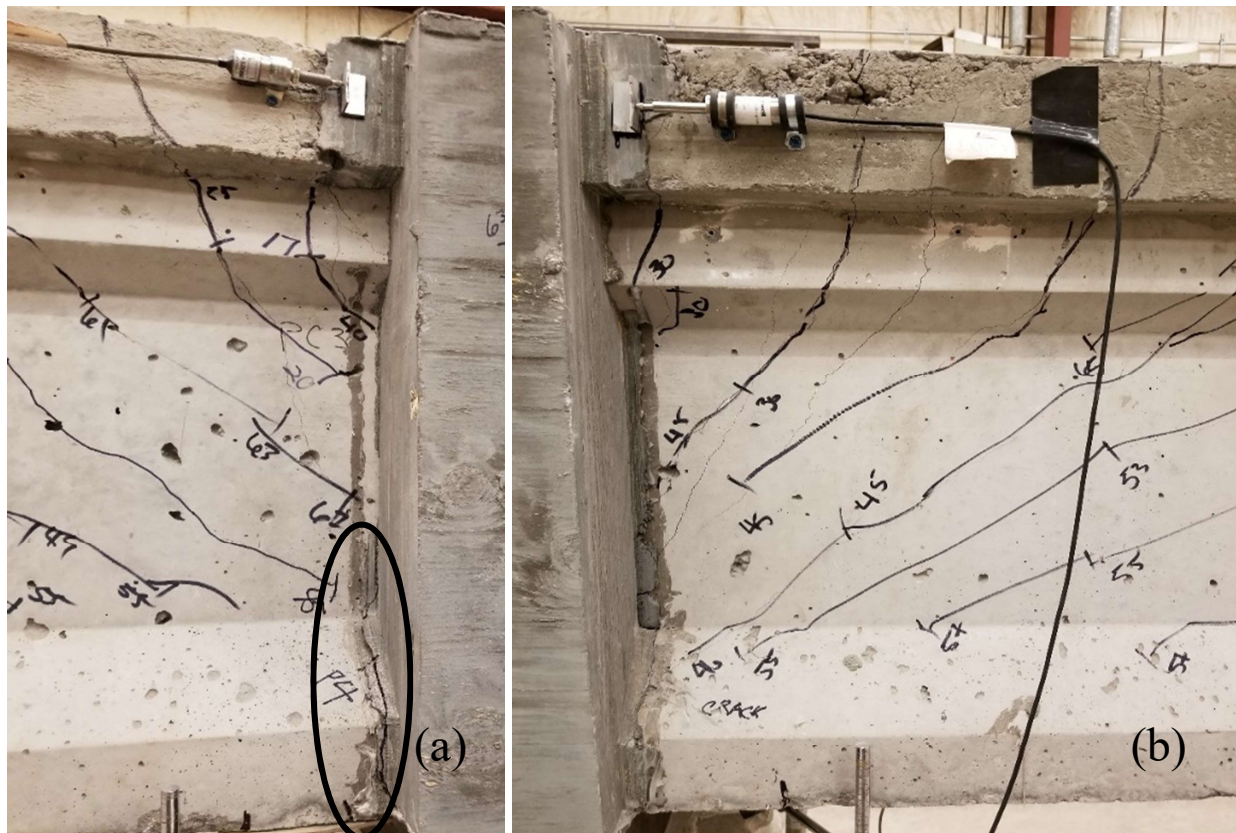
Positive moment joint separation at the interface between the NC3-N girder and the UHPC joint (a) indicated by a dark oval and interface between the NC3-S girder and the UHPC joint showing no visible positive moment cracking (b)
